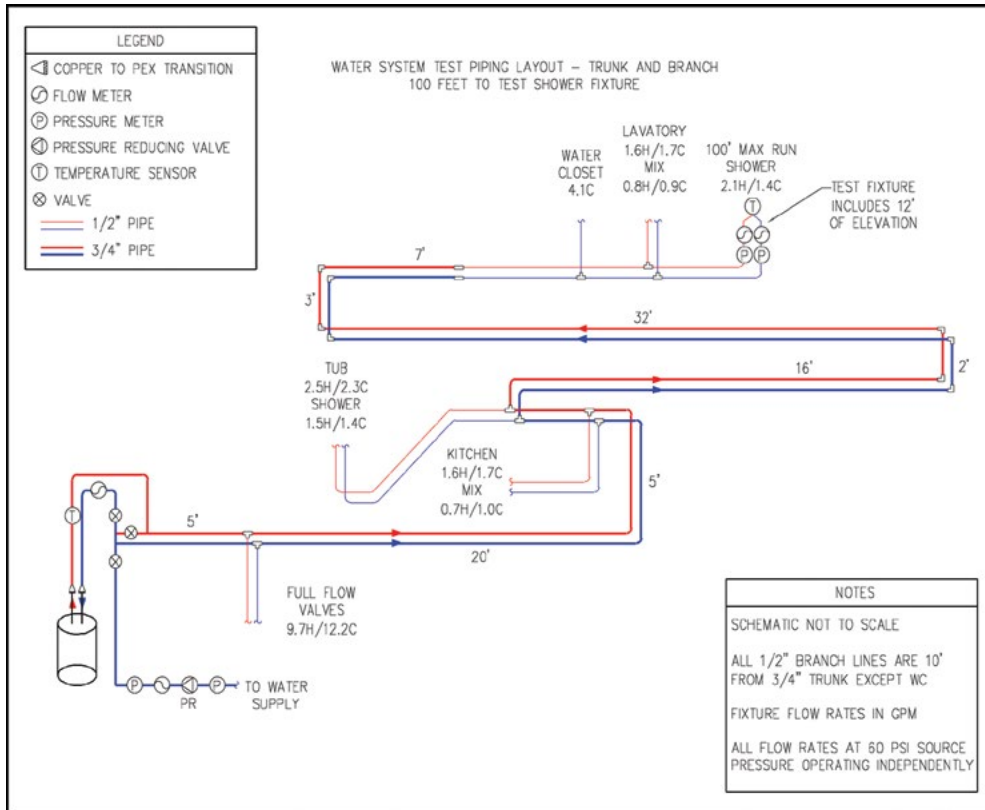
Water System Test Piping Layout – Trunk and Branch, 100' to TF
